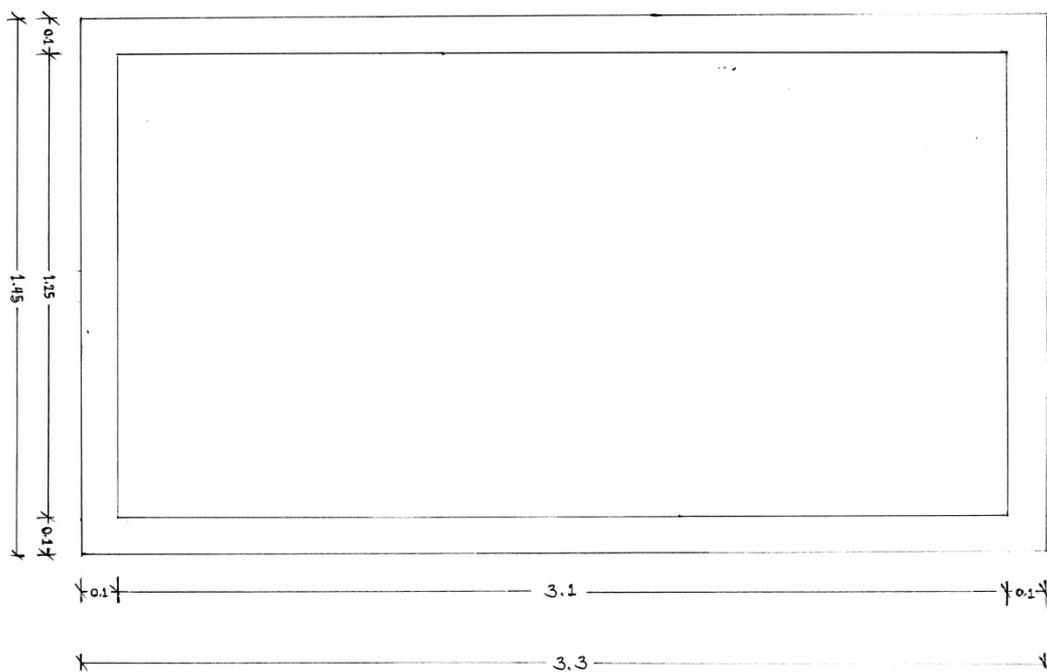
Our Construction Plan for The New Precipitation Section (top view)
